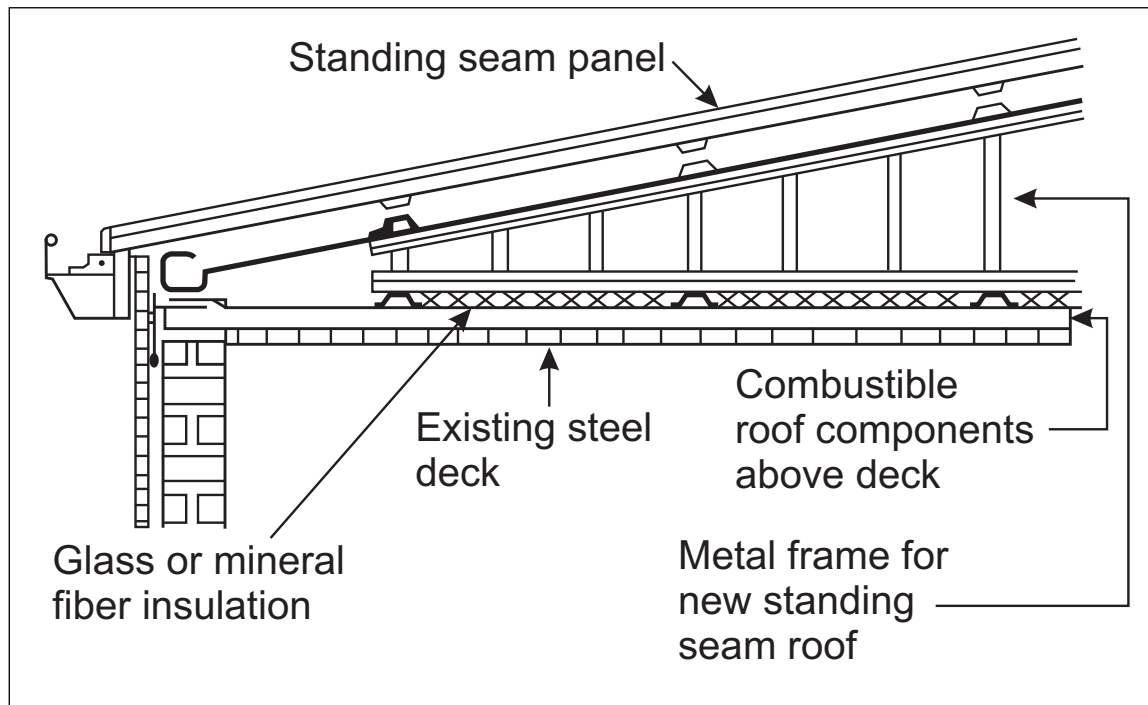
Standing seam roof in re-cover construction resulting in a concealed space
